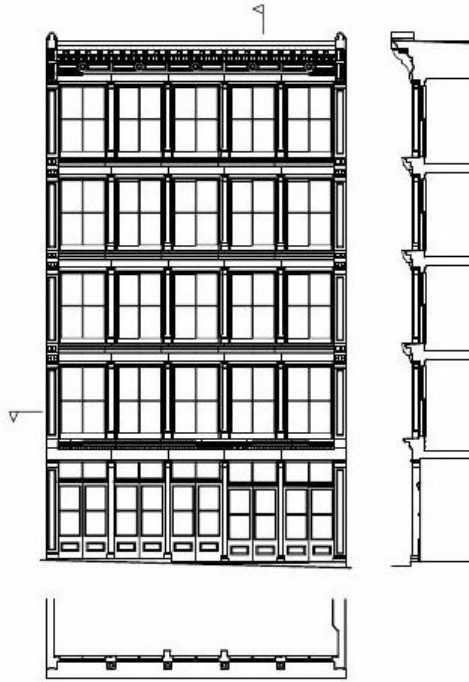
Partial Section and Partial Floor Plan of the Thomas Gantt Building
